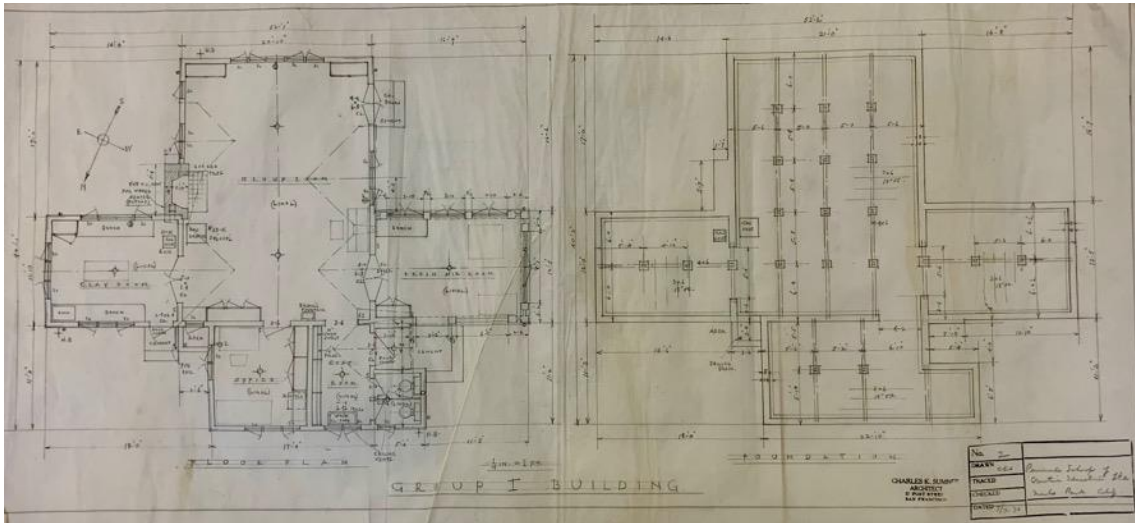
Group 1 (Building 1) Floor Plan and Foundation Plan, Charles K. Sumner, 1930
